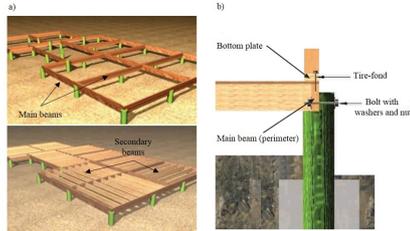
(a) Example of main beams, which connect the wooden piles at the first floor level, and an example of secondary beams. (b) Detail of the connection between timber walls, horizontal platform and wooden piles (Fritz, 2007).
